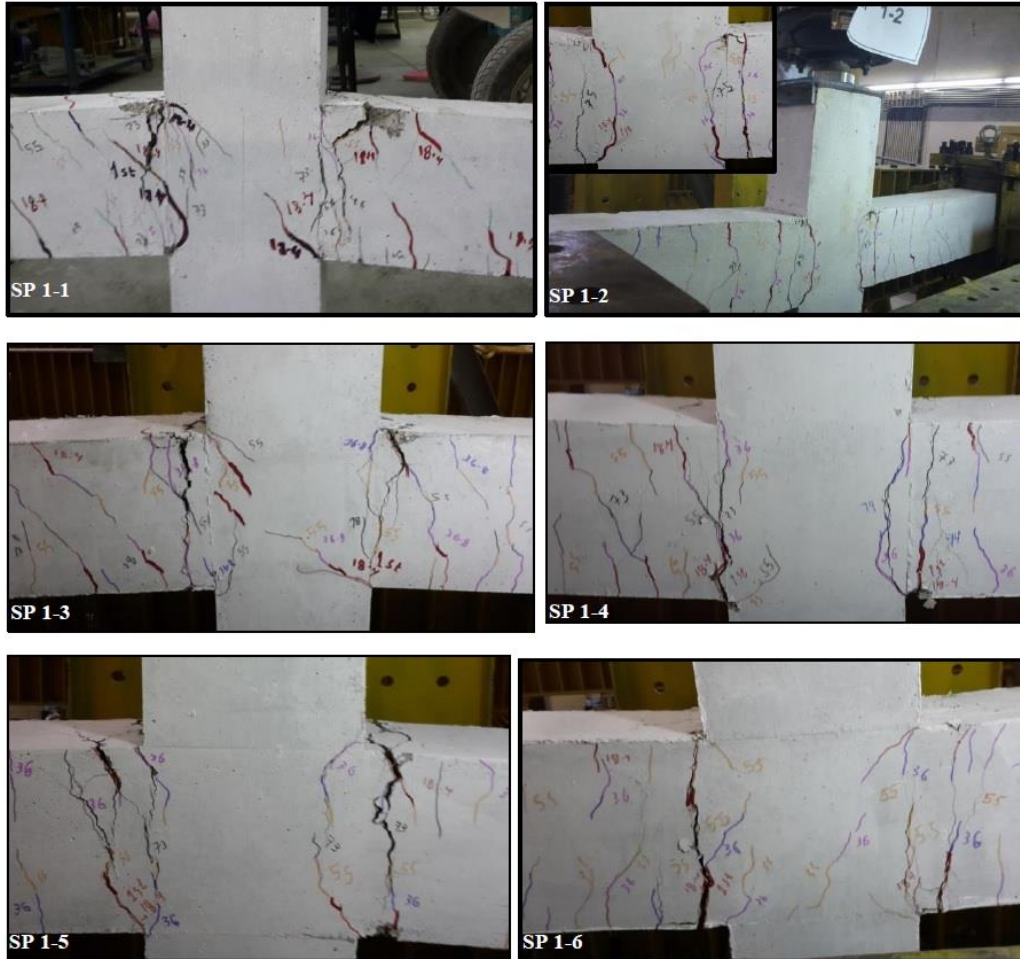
The cracking pattern at failure for specimens of group (G1)
